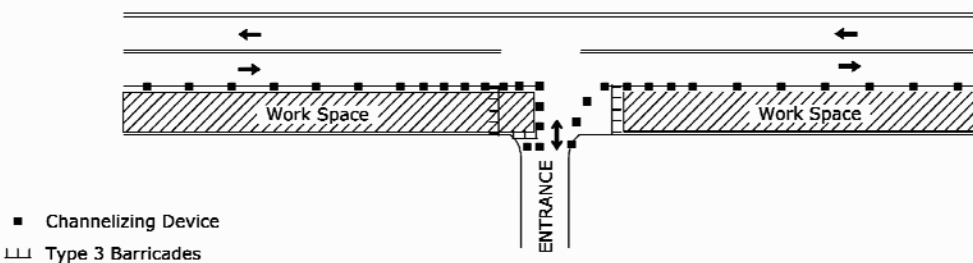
SIDE ROAD OR ENTRANCE CONSTRUCTED HALF AT A TIME:
